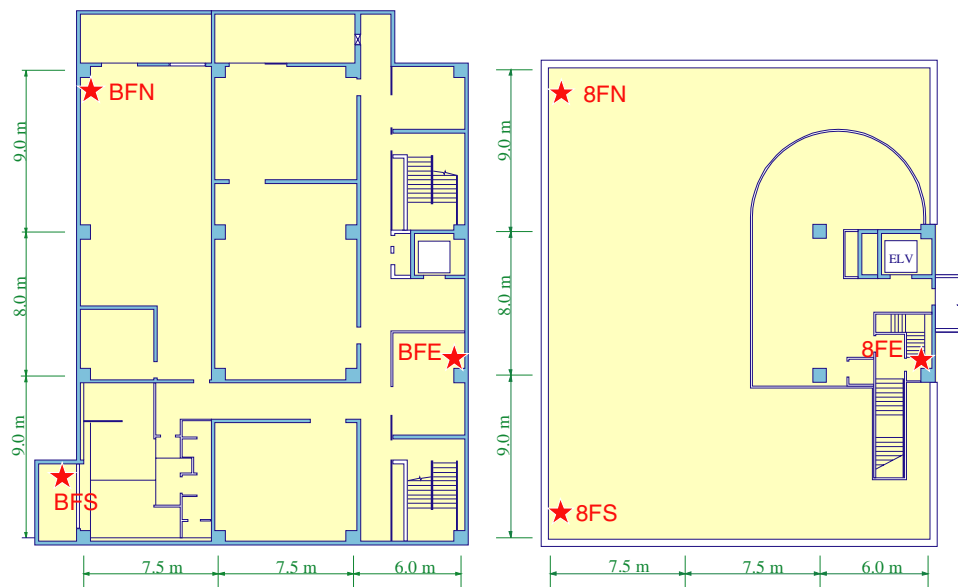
Sensor configurations at basement floor (left) and 8th floor (right)
